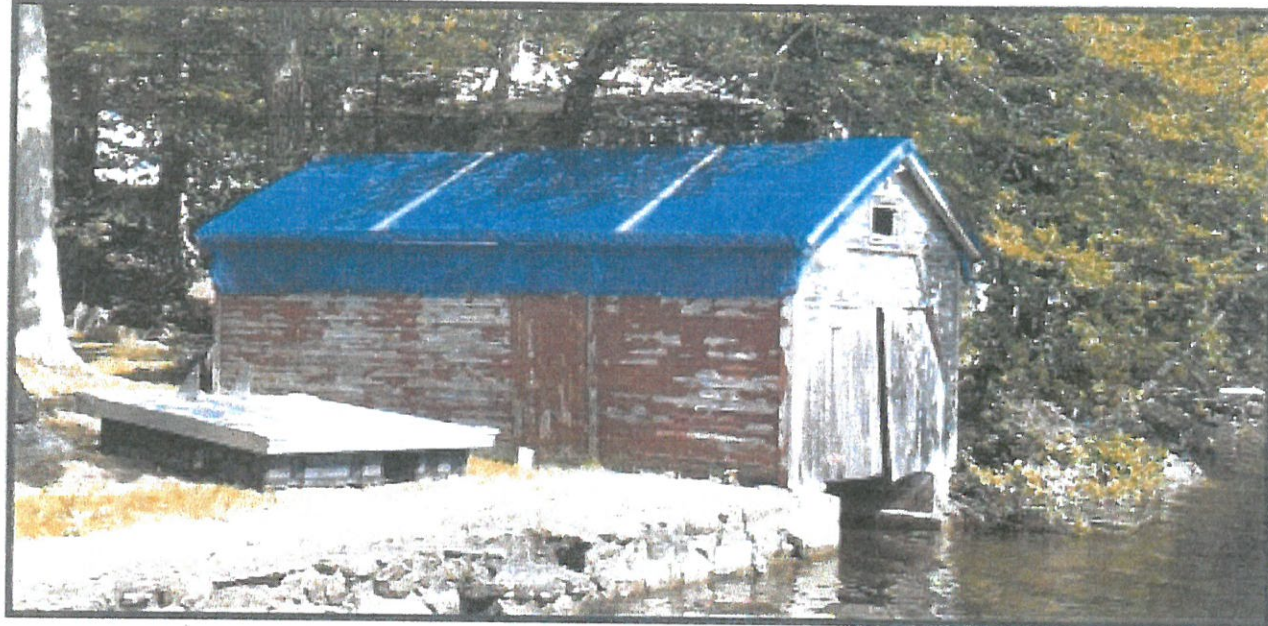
This is a rear view of the existing boathouse and area of impact, facing Lovell Lake.
